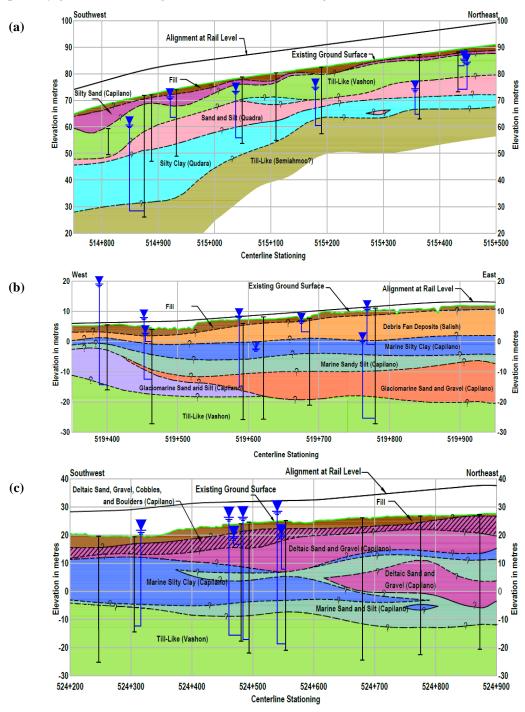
Typical soil profile for a) Segments 1 and 2; b) Segments 3 and 4; and c) Segment 5.
